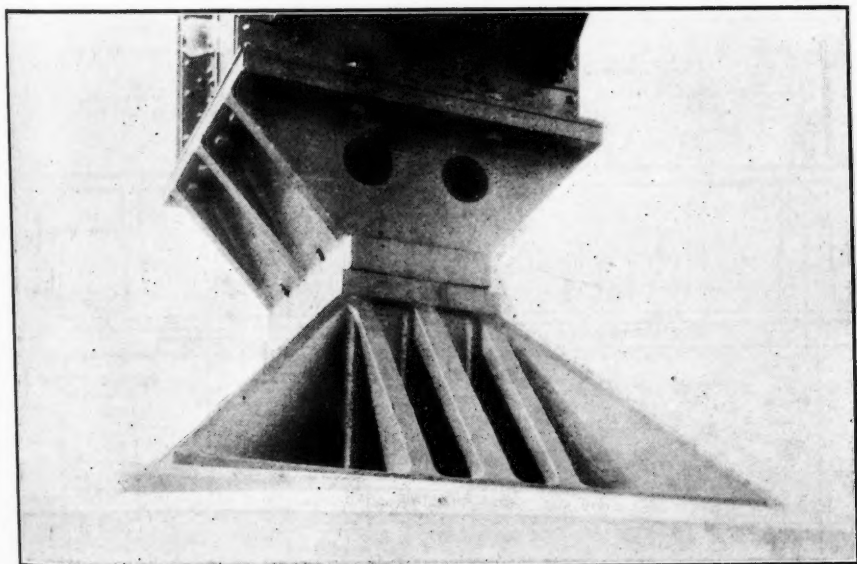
ROCKER CASTINGS AT BASE OF TOWER LEG, FLORIANOPOLIS BRIDGE.
